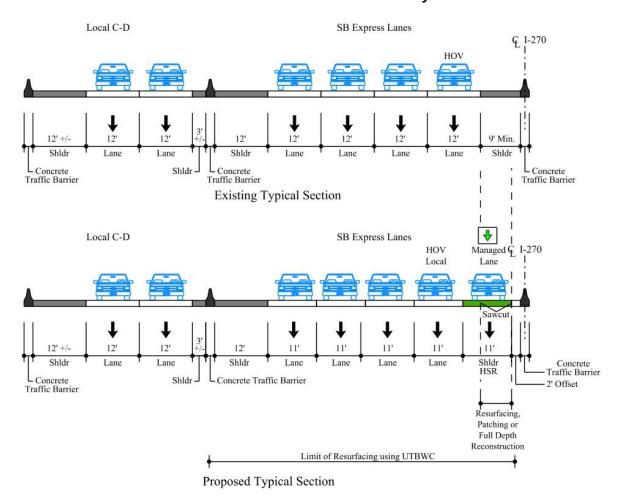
Existing and Proposed Typical Sections SB IS-270 between Muddy Branch Road and Montrose Road
